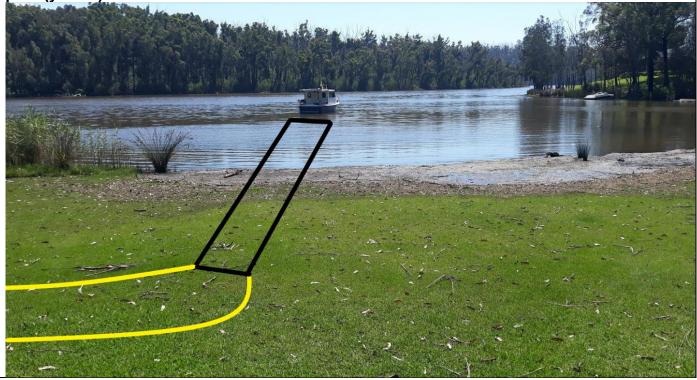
Existing concrete path at Hoylake Grove Reserve to which the concrete path from the jetty would connect – approximately shown in yellow
